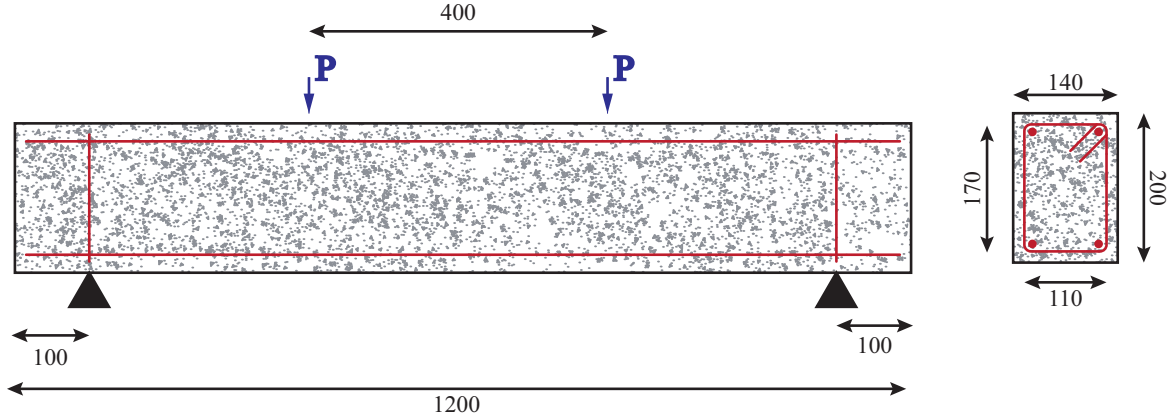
Short beam reinforcement blueprint, not a scale.
